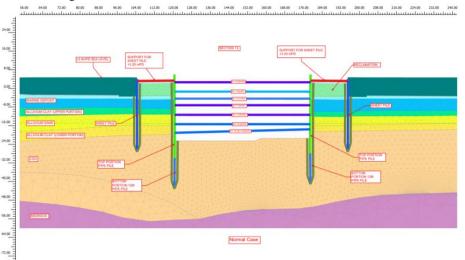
PLAXIS modelling of ELS and Mega Truss Strut
